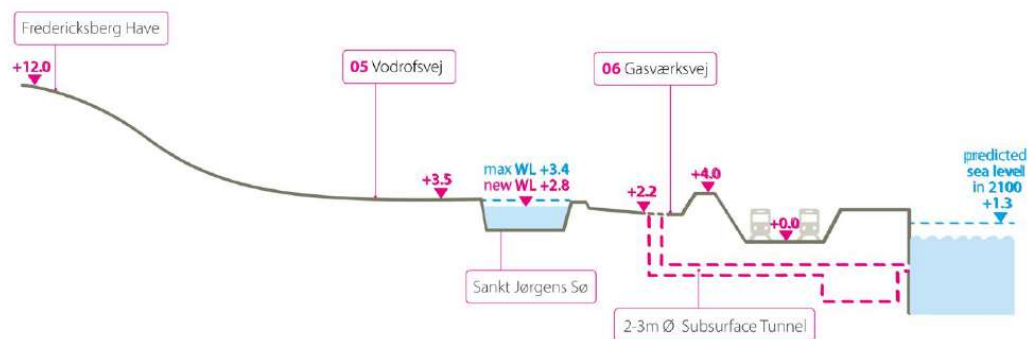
Concept design of a by-pass sub-surface stormwater tunnel diverting excess water from Sankt Joergens Lake to the waterfront without affecting the railway system.
